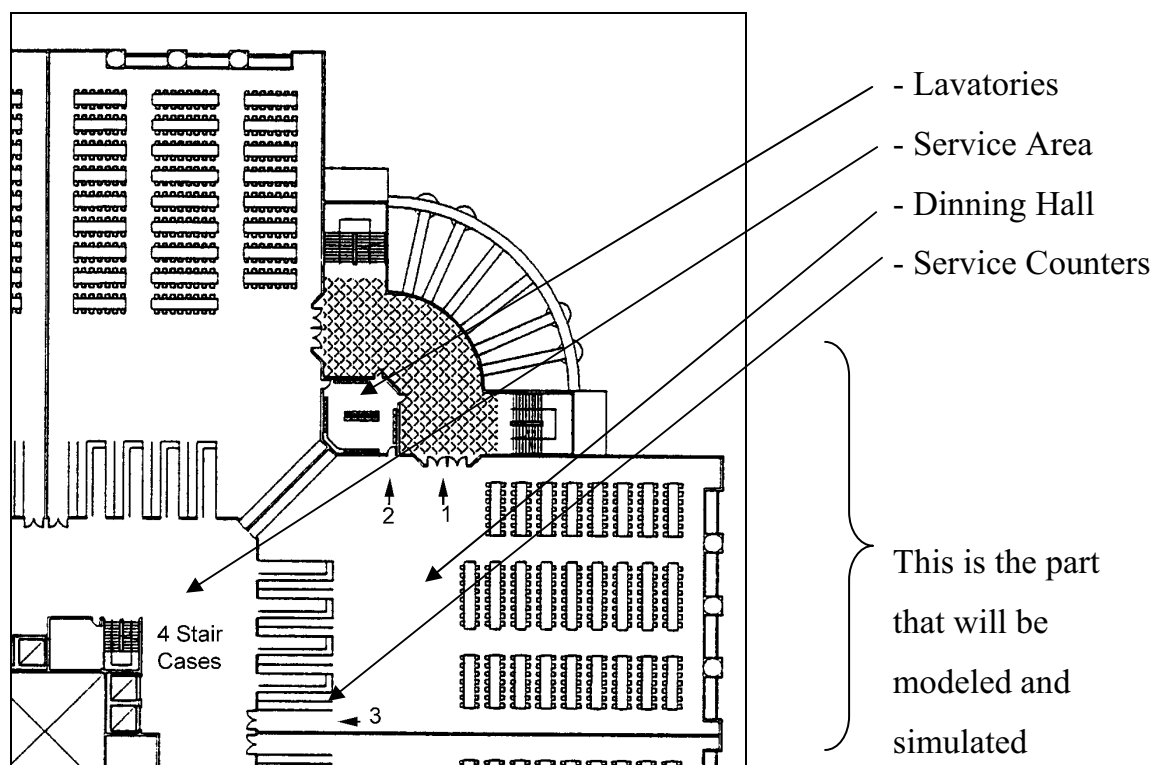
The Proposed Design (First & Second Floors Plan). In the central core (left) the two large stair cases were replaced by four smaller stair cases. Escape route 3 was equipped by a double door.
